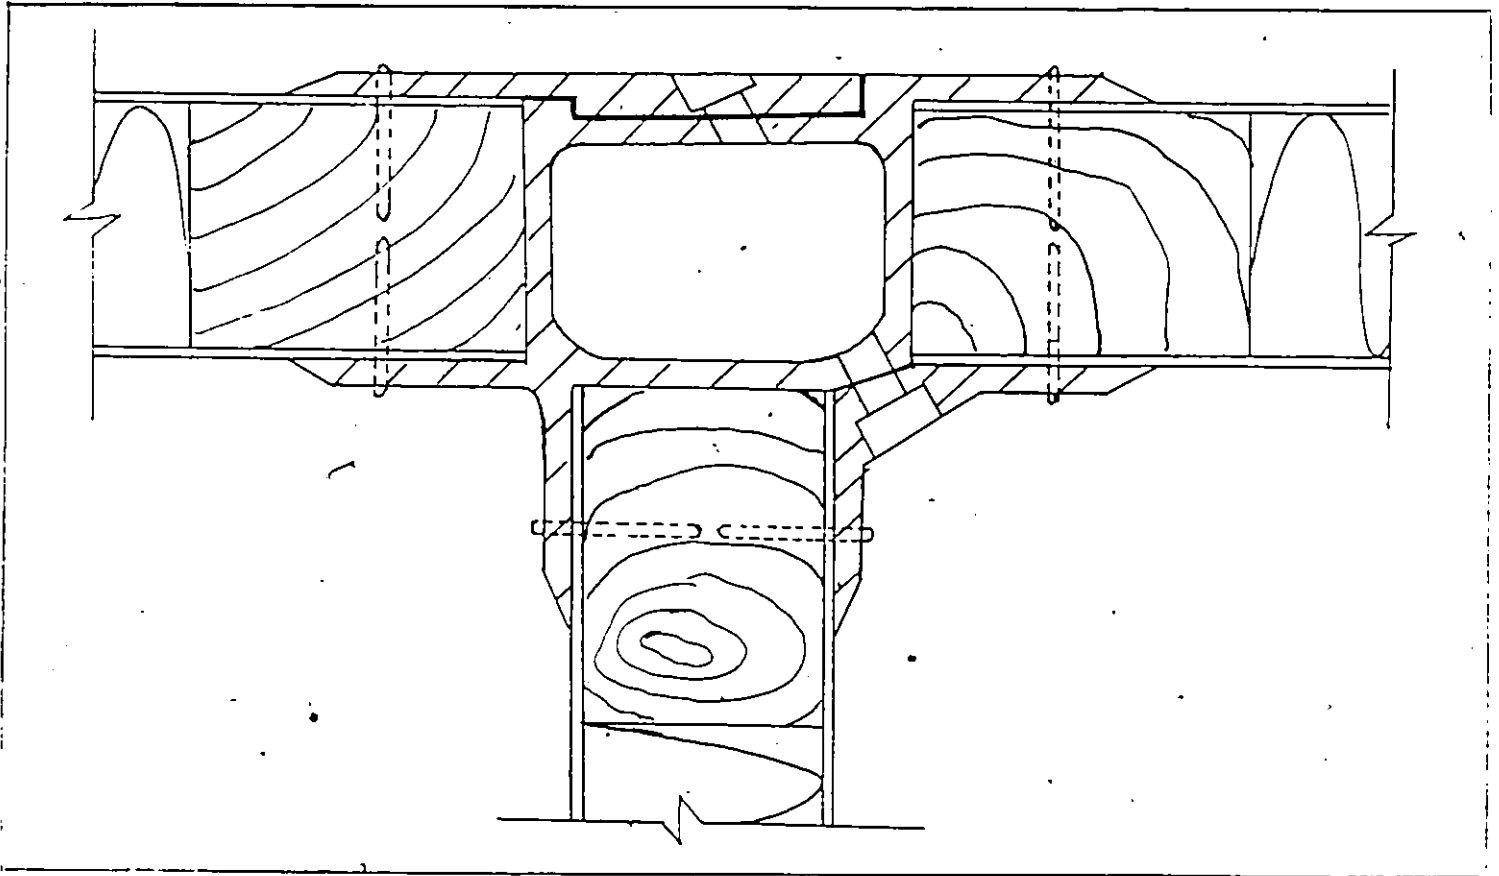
PROPOSED CONNECTION FOR THREE PANELS
